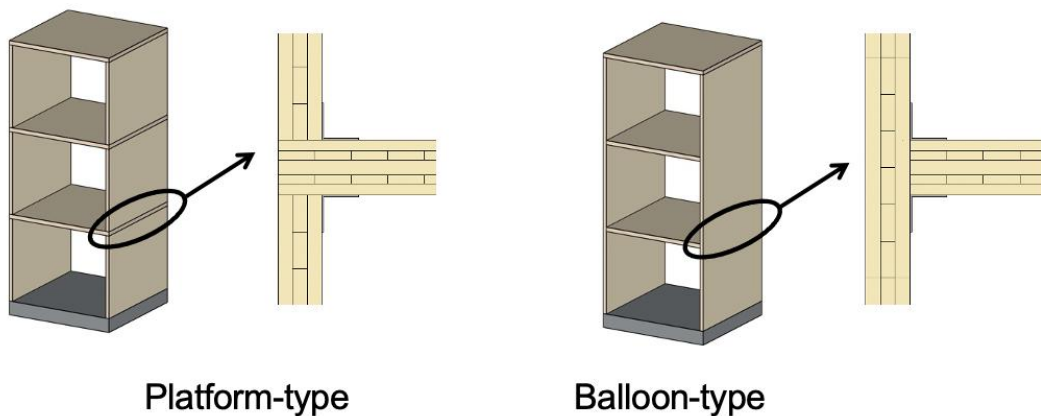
Platform-type and balloon-type CLT panelised buildings
